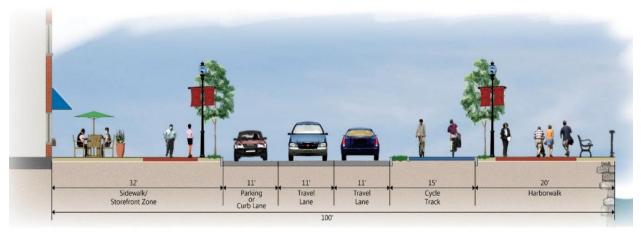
Dorchester Avenue – Typical Cross-Section (Proposed) Looking Northeast
